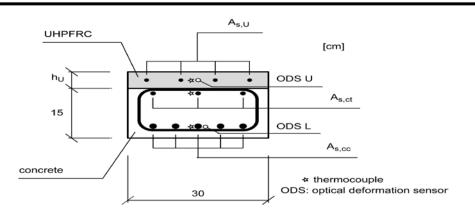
Cross-section of the composite "UHPFRC-concrete" beams ^[15]
